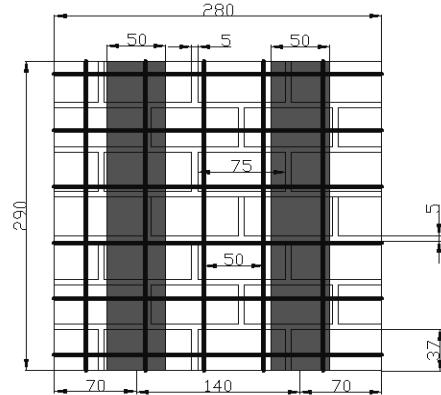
Details of GFRP+PP-band retrofitted masonry wallet
